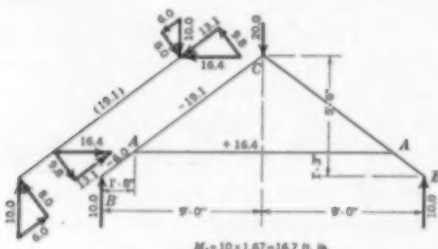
ROOF TRUSS WITH TIE ABOVE SUPPORTS
